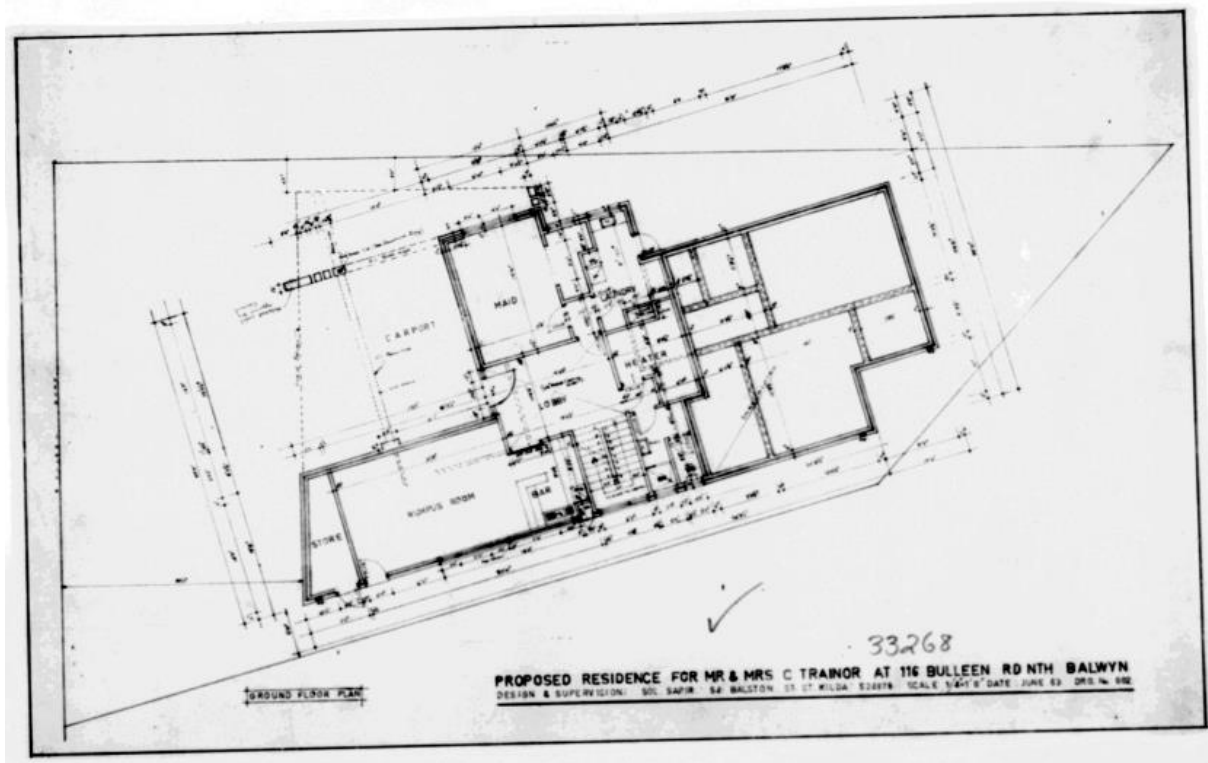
Ground floor plan for 116 Bulleen Road, North Balwyn. (Source: BP 33268)
